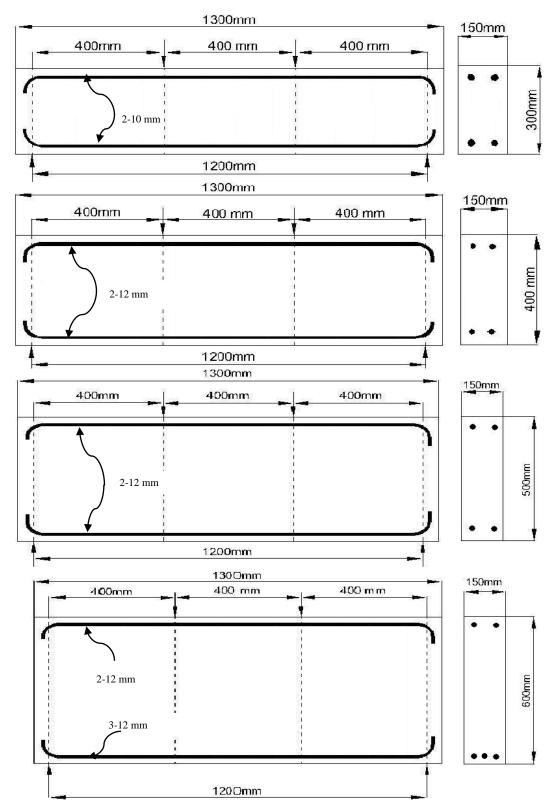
Reinforcement Details Of Moderate Deep Beam Without Web Reinforcement
